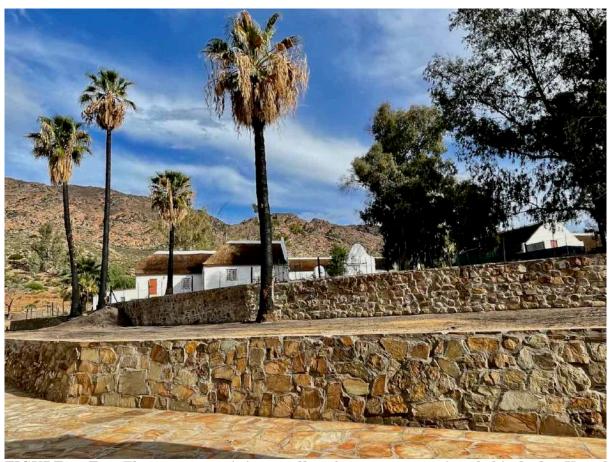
E: The stone retaining walls after reconstruction behind the Hostel Buildings. (Image ARCON, 8 June 2021).
